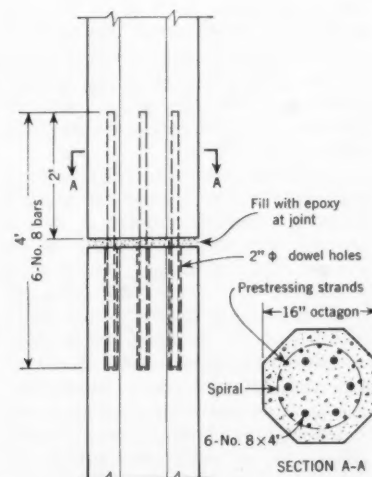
Pile splice detail. Dowels are secured with epoxy.
